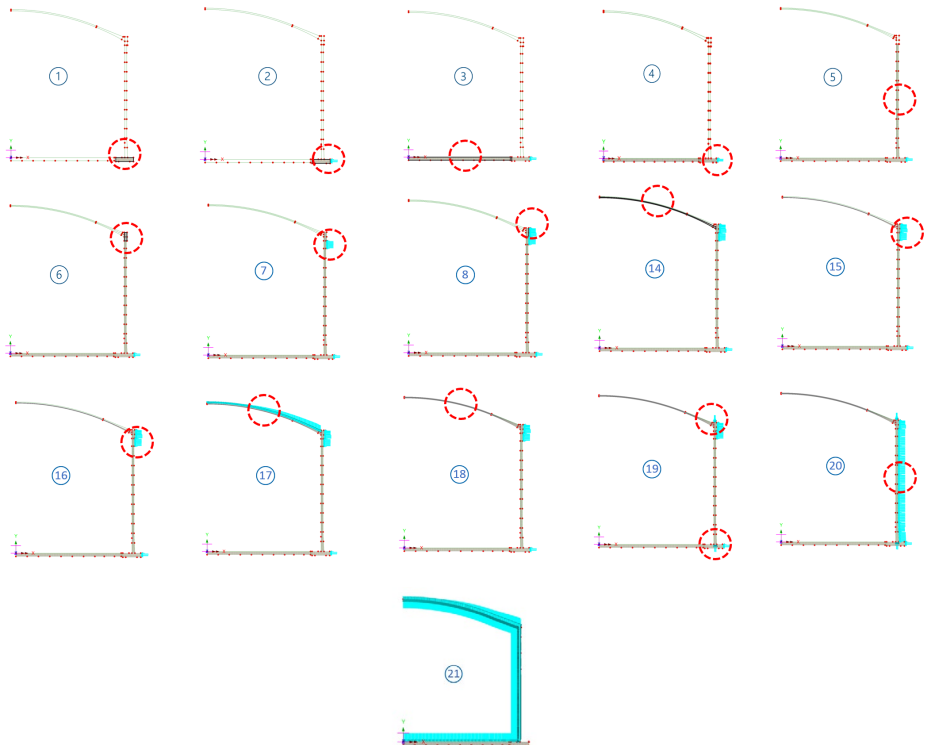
Activation and Deactivation in a Staged Construction Analysis Model– Layered roof option 2
